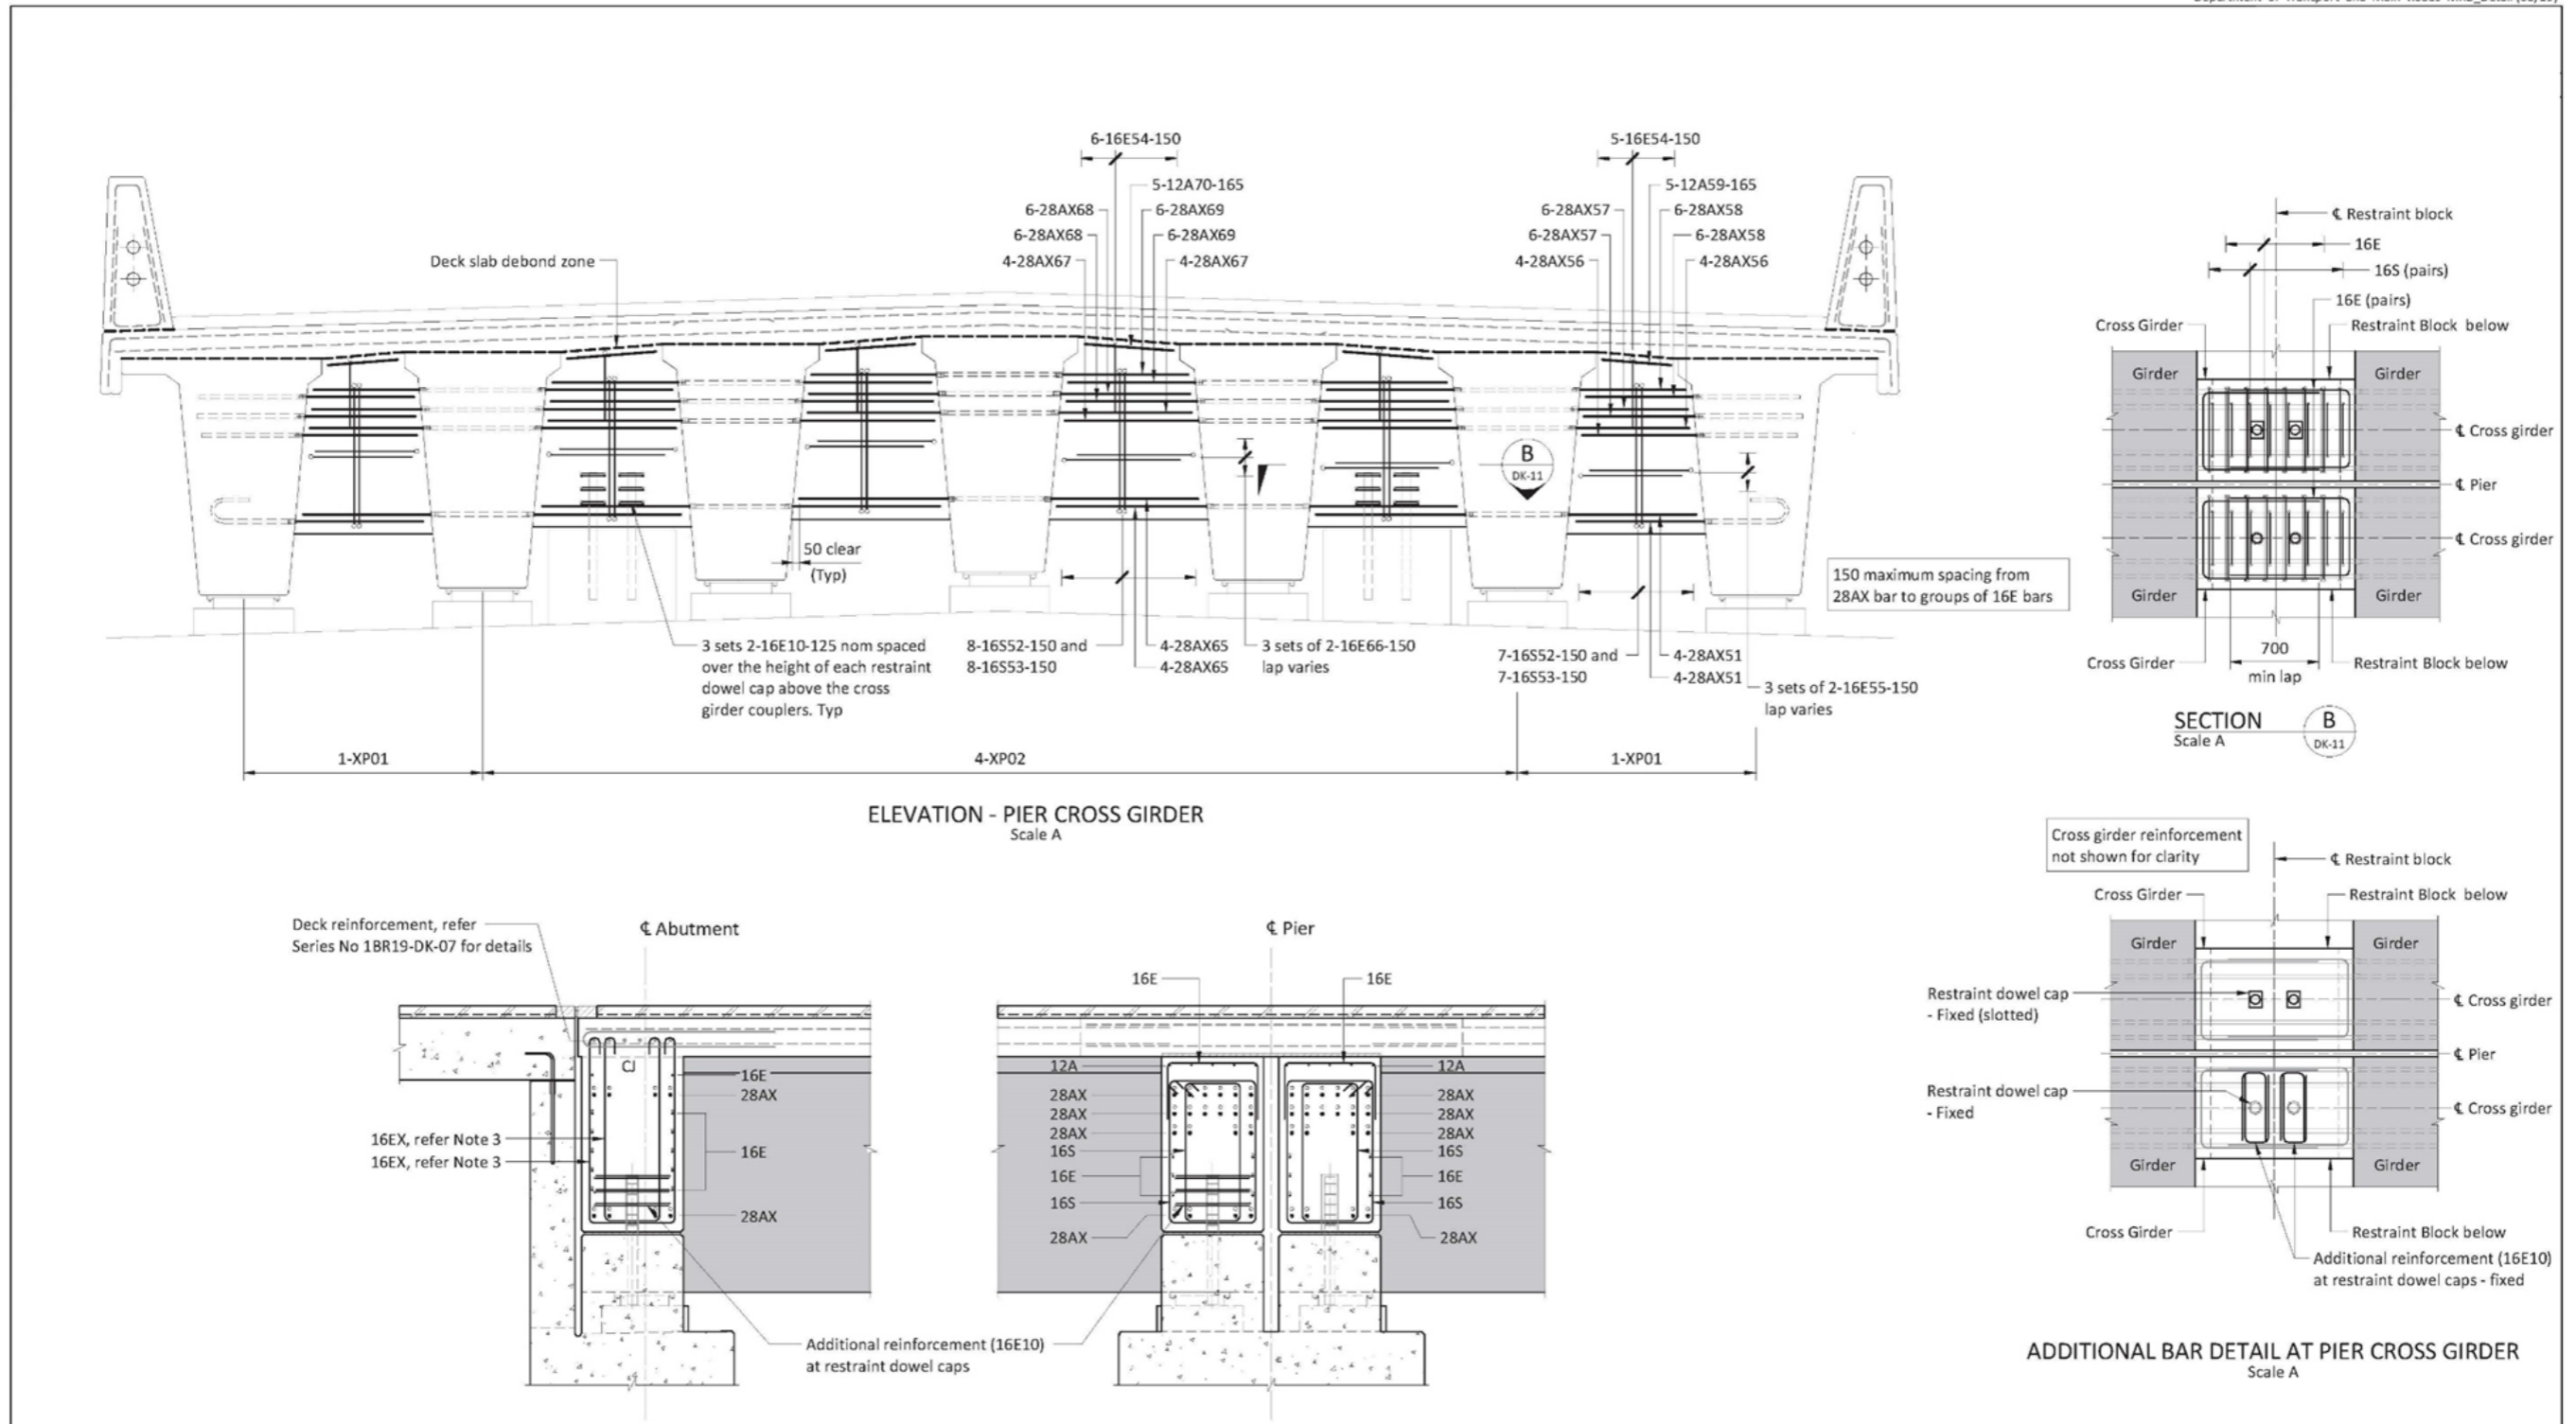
(j) - Prestressed concrete girders deck - Sheet 9
